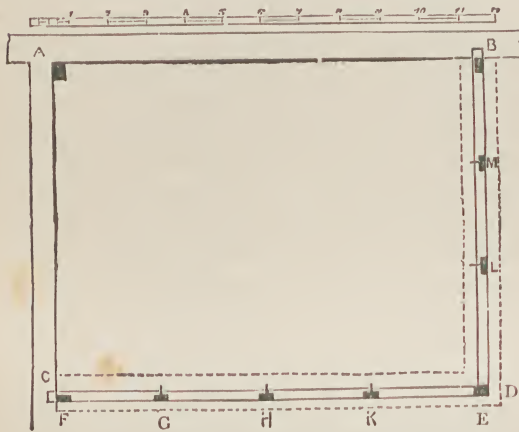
PLAN OF CONCRETE SLAB BUILDING.
